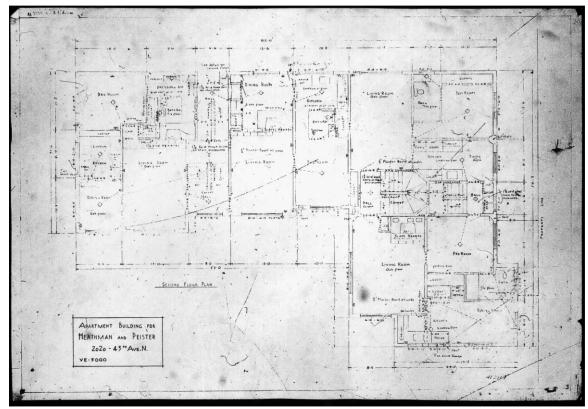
"Apartment Building for Heathman and Peister 2020-43rd Ave. N. ... [Building Permit] 412969"
